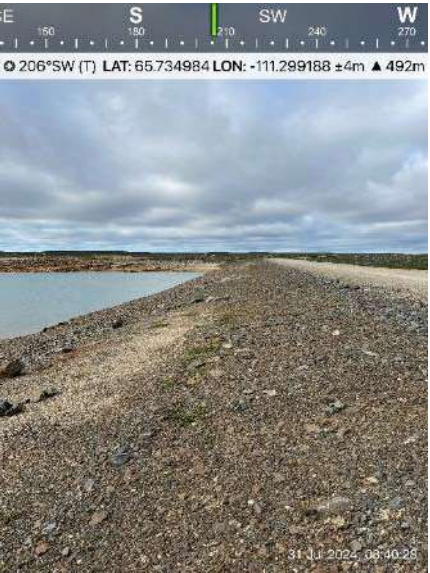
The upstream embankment and Pond 2 at Dam 2.
